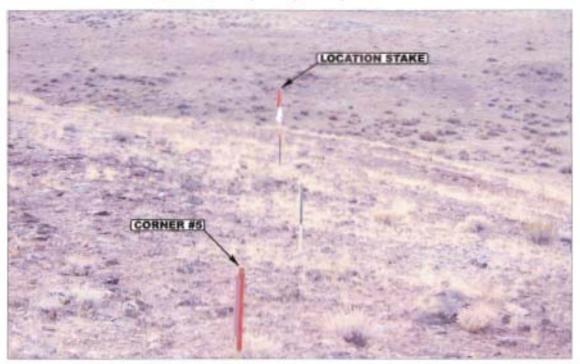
PHOTO: VIEW FROM CORNER #5 TO LOCATION STAKE
